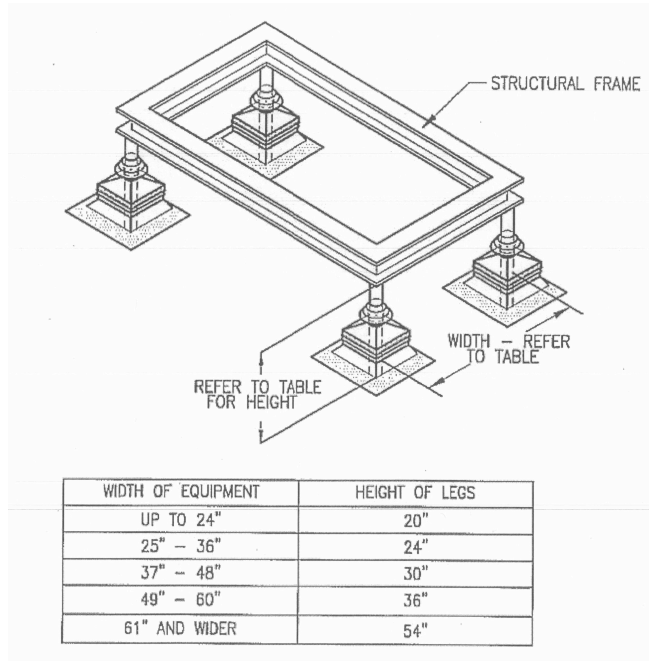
ELEVATED MECHANICAL PLATFORM SUPPORT STRUCTURE FOR INSTALLATIONS ABOVE ROOF
